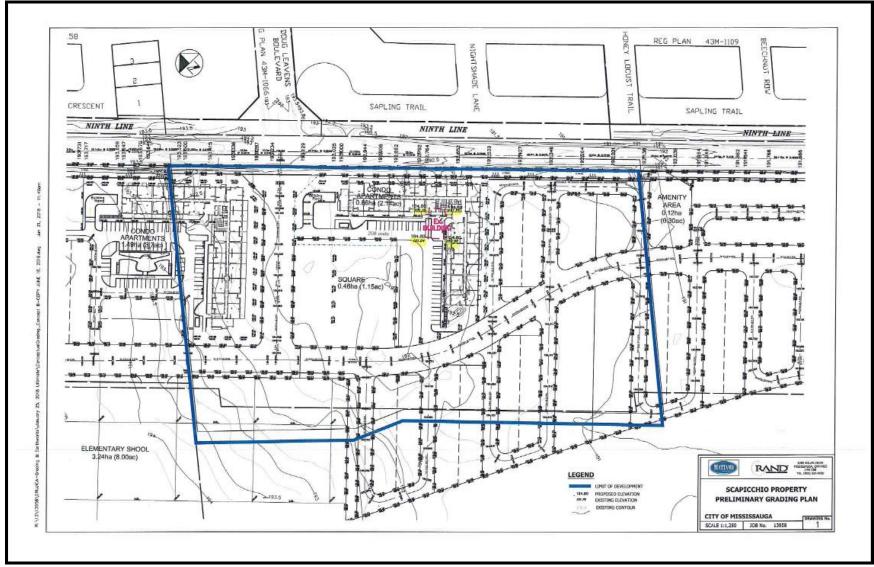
6432 Ninth Line Preliminary Grading Plan (RAND Engineering Corporation 2018b)
